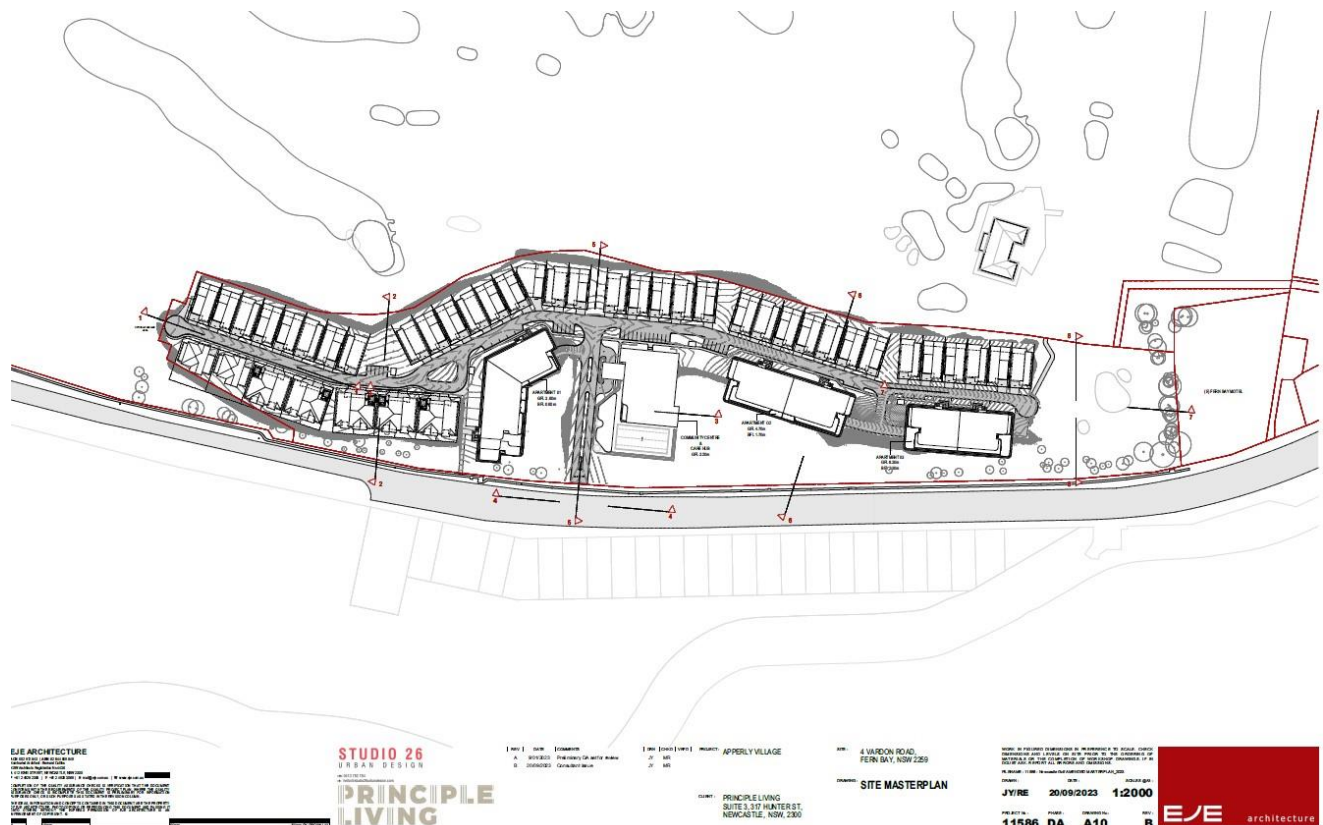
Site Masterplan (Source: EJE Architecture)
